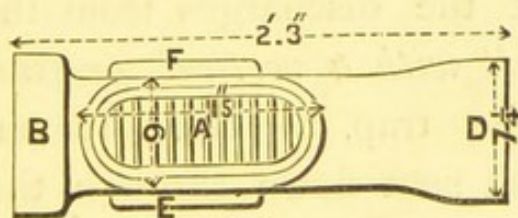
Plan of a 6-in. "Ventilating Drain-syphon and Sewer-interceptor."
